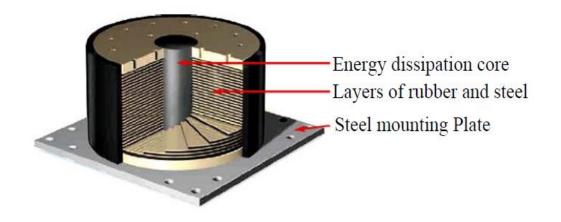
the Lead Rubber Bearing. (The top mounting plate is not shown)
